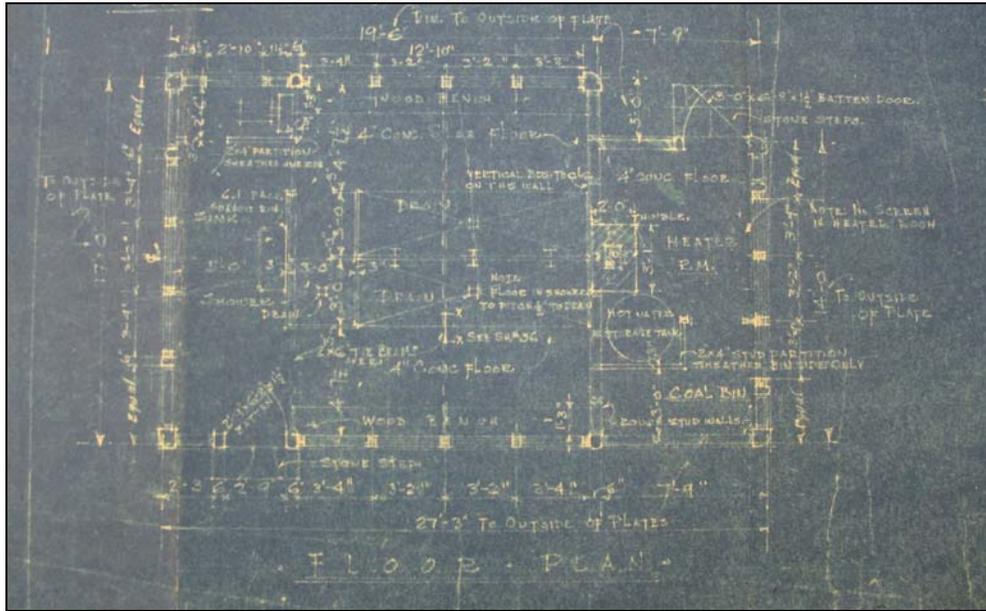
Floor Plan from Camp 1 Central Bath House Blueprint, 1936.
